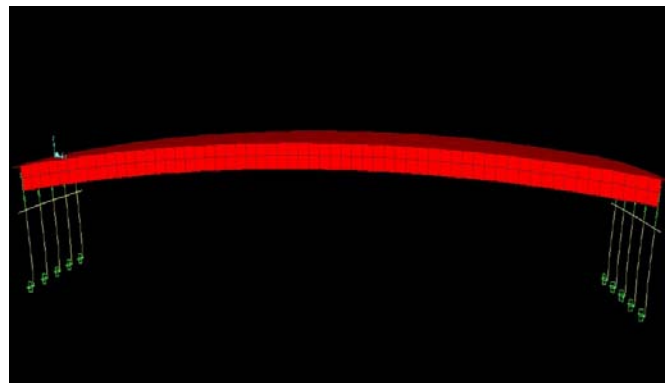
Deformed shape of the single span integral abutment bridge model for temperature load
